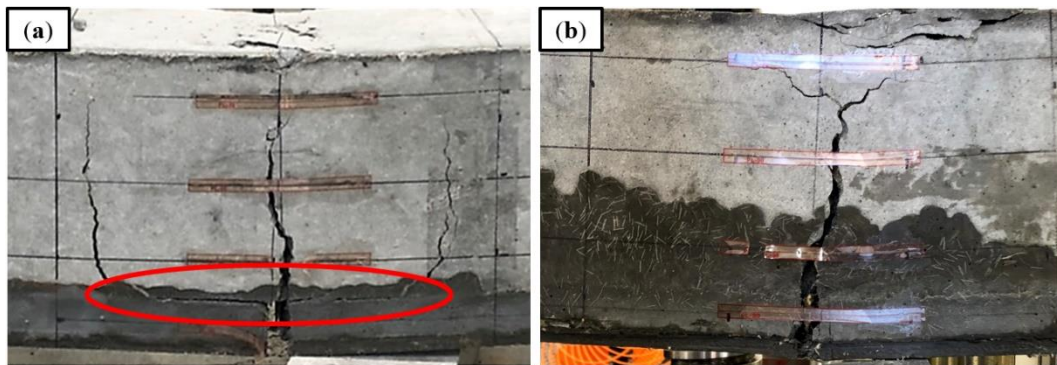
(a) detachment of the precast layer from the existing beam of the PLS_FA0 specimen; (b) integrity retention between the beam and strengthening panel after beam failure of the PL_N40_FA70 specimen.
